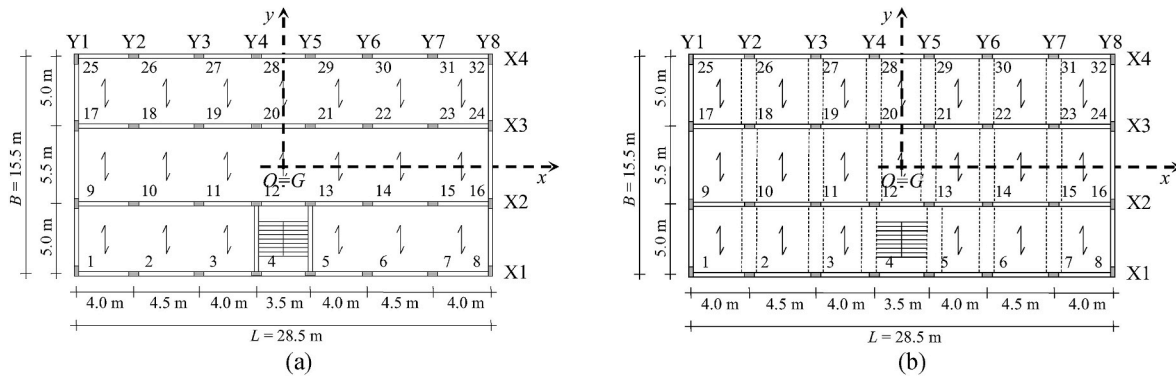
Plan layout of case study buildings: (a) GL building (b) SR building.
